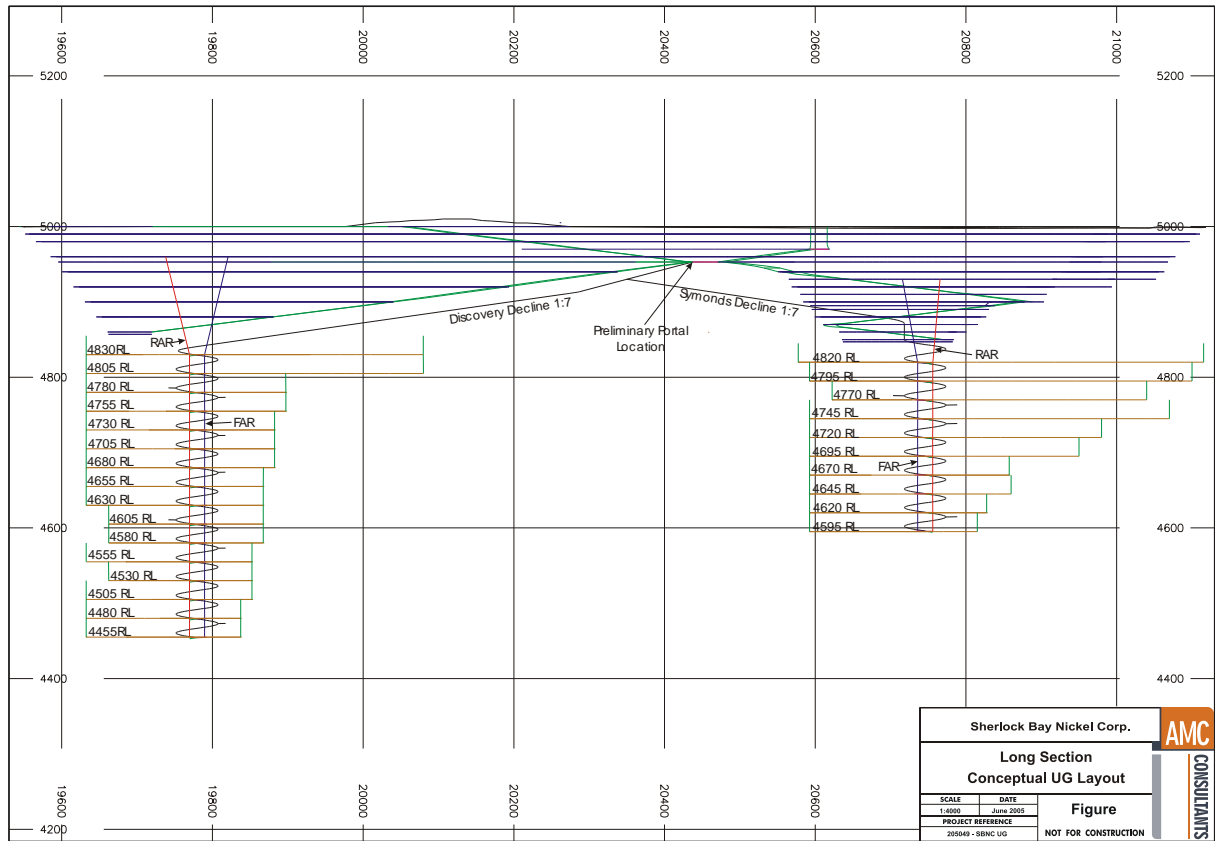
Long section of conceptual Sherlock Bay underground mine layout
